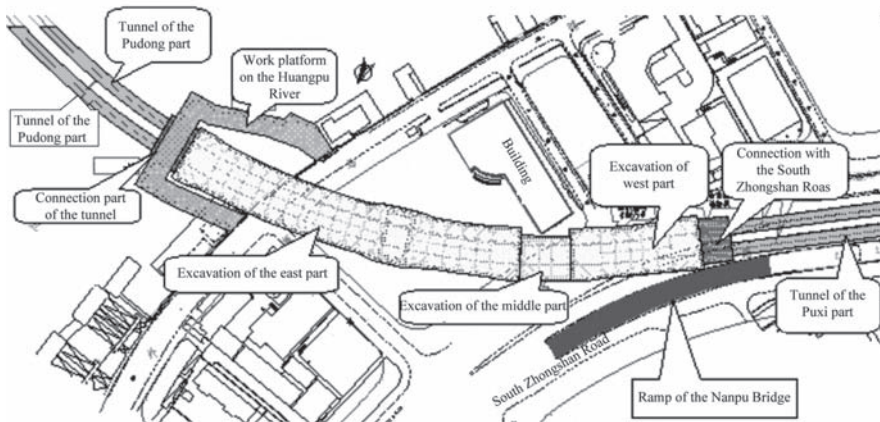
Plane view of the remediation project of the collapsed tunnel of Metro Line 4 (according to Tang and Zhu, 2009).
